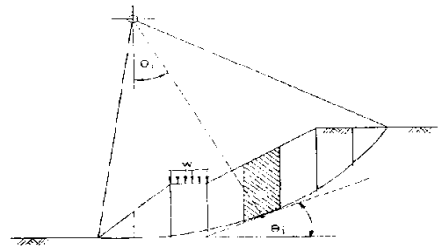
Cross section of the sliding and the soil slices (Mairaing, 2003).
